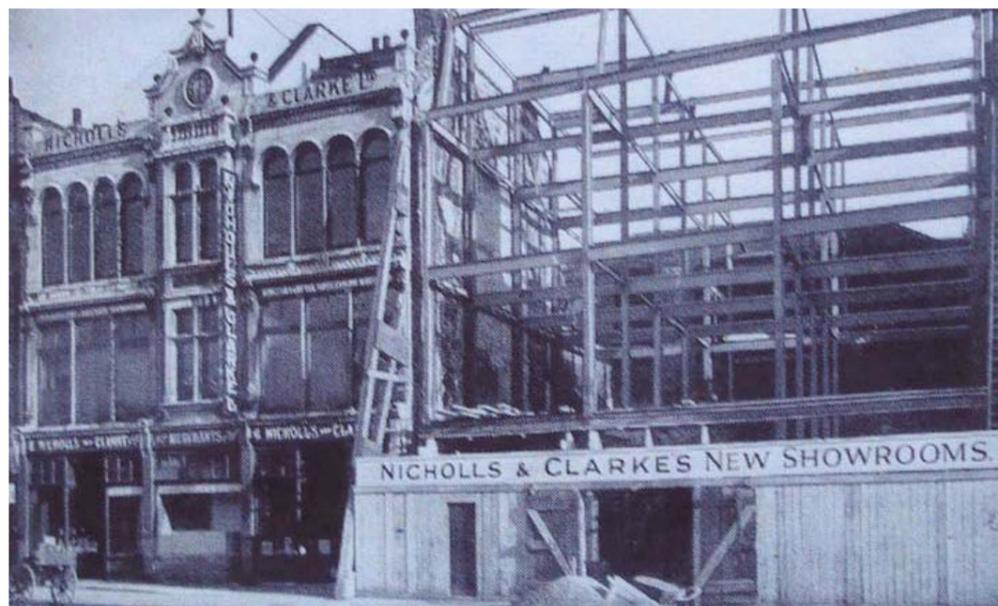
The new Nicholls and Clarke block on Shoreditch High Street under construction. The façade to the block to the left was demolished but the new faience elevation borrowed from its composition retaining a central single bay with a more prominent parapet line and clock to add emphasis.
